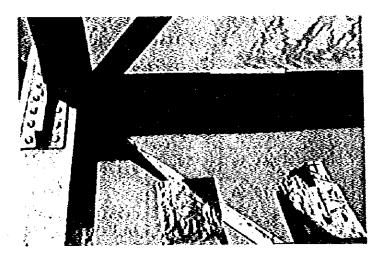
Corrosion at the inner side of lower lateral bracing
